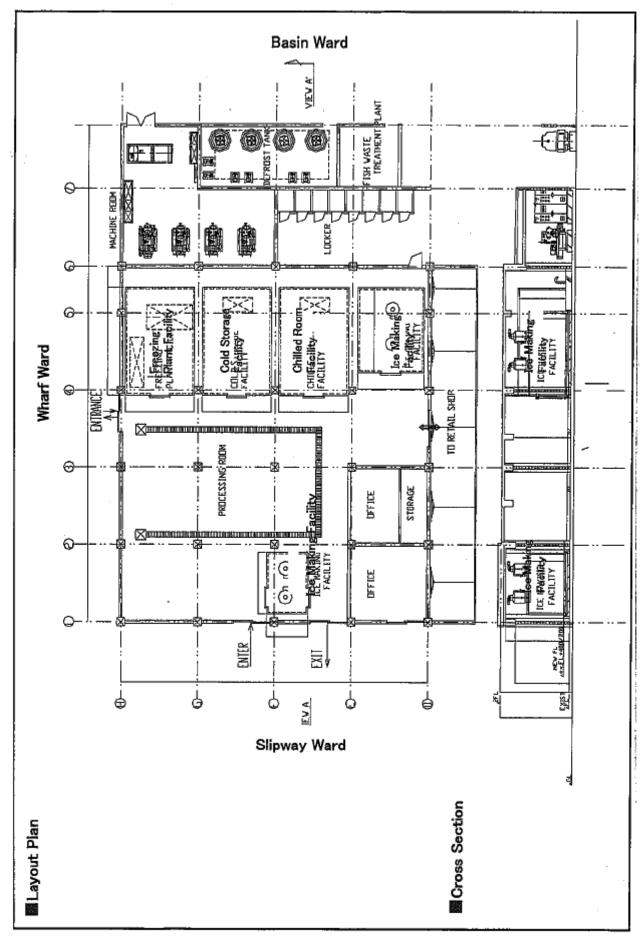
(4) Restoration Plan and Cross Section of Fisheries Center, Ground Floor
